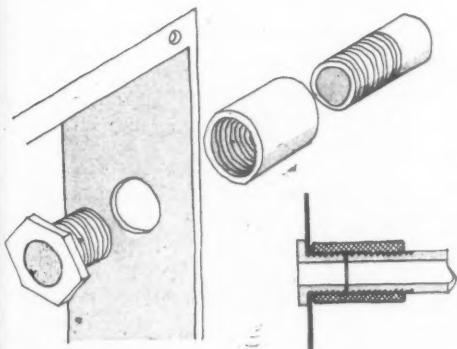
(far left), method of connecting conduit to a sheet steel box.
